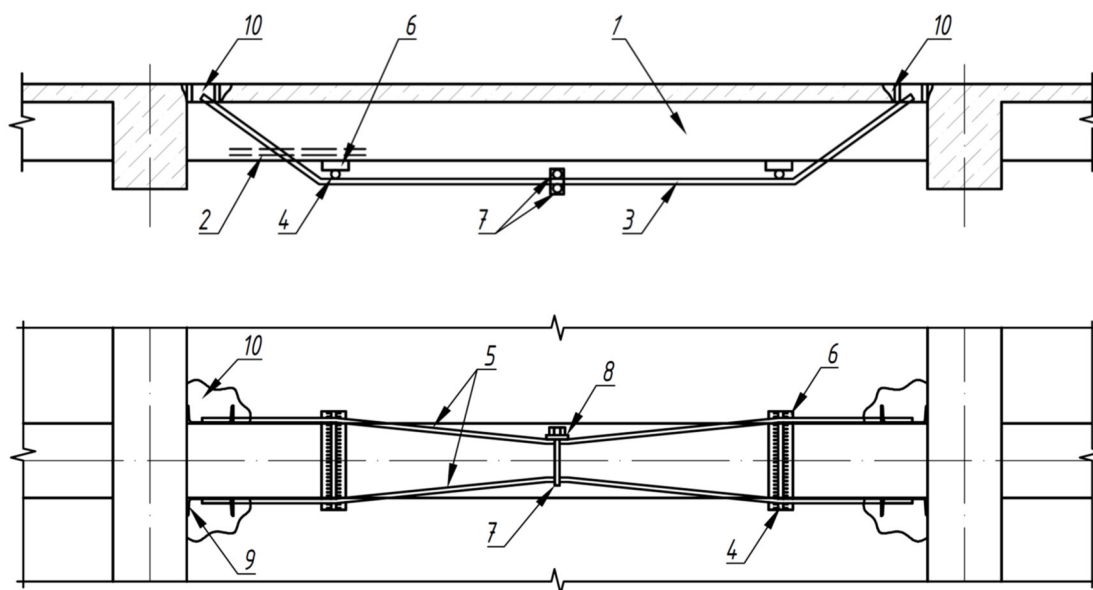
Strengthening of the beam of the monolithic reinforced concrete floor slab with the trussing rod
